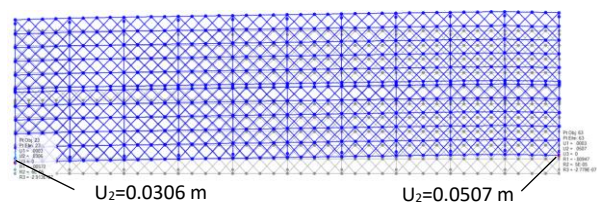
The deformed shape under loading +EYP (semi-rigid diaphragm)
